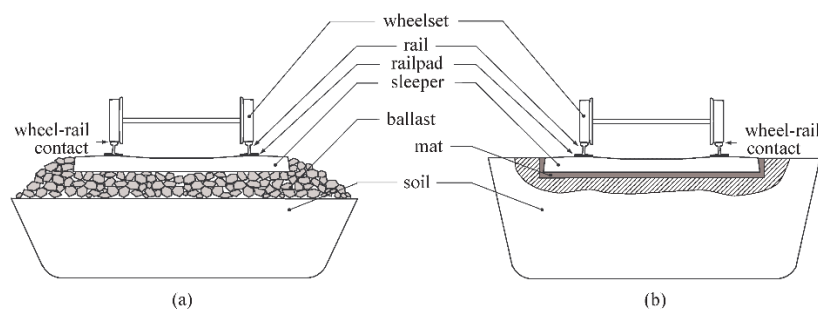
Track components (a) Ballasted track; (b) Ballastless track (Review of Trackside Monitoring Solutions, n.d.)
